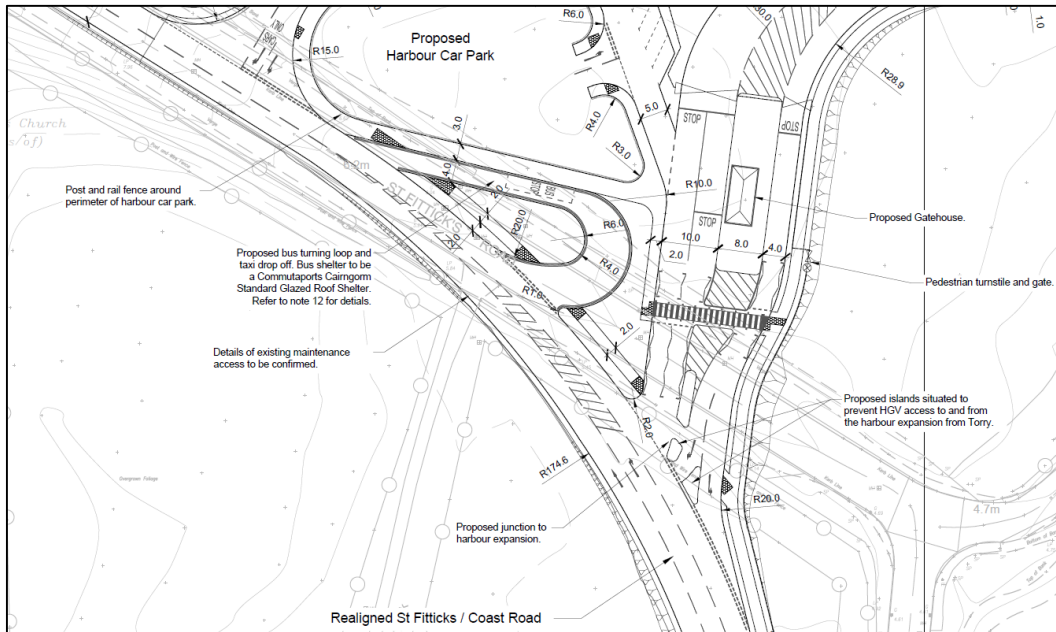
Road Layout drawing highlighting the proposed traffic islands
